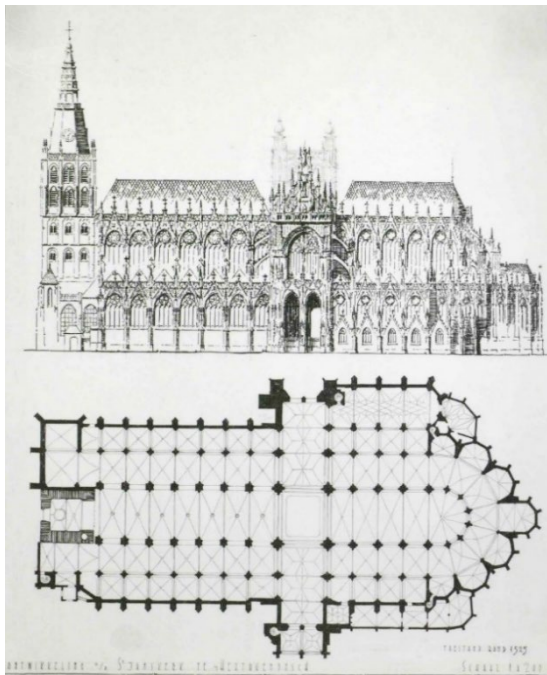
View of the southside of the church with floorplan (in 1525)⁵.
